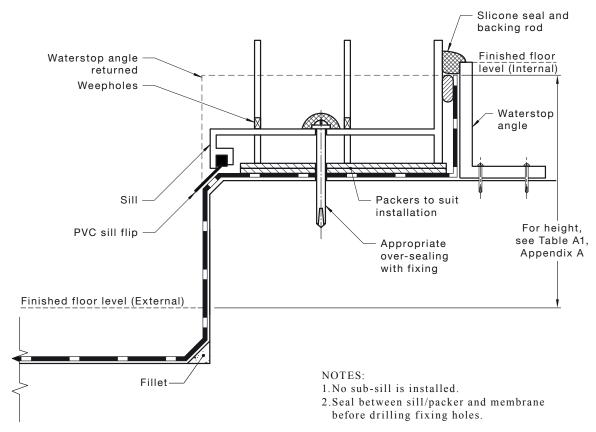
(in part) TYPICAL DETAILS OF MEMBRANE TERMINATION AT EXTERNAL OPENING DOORS
